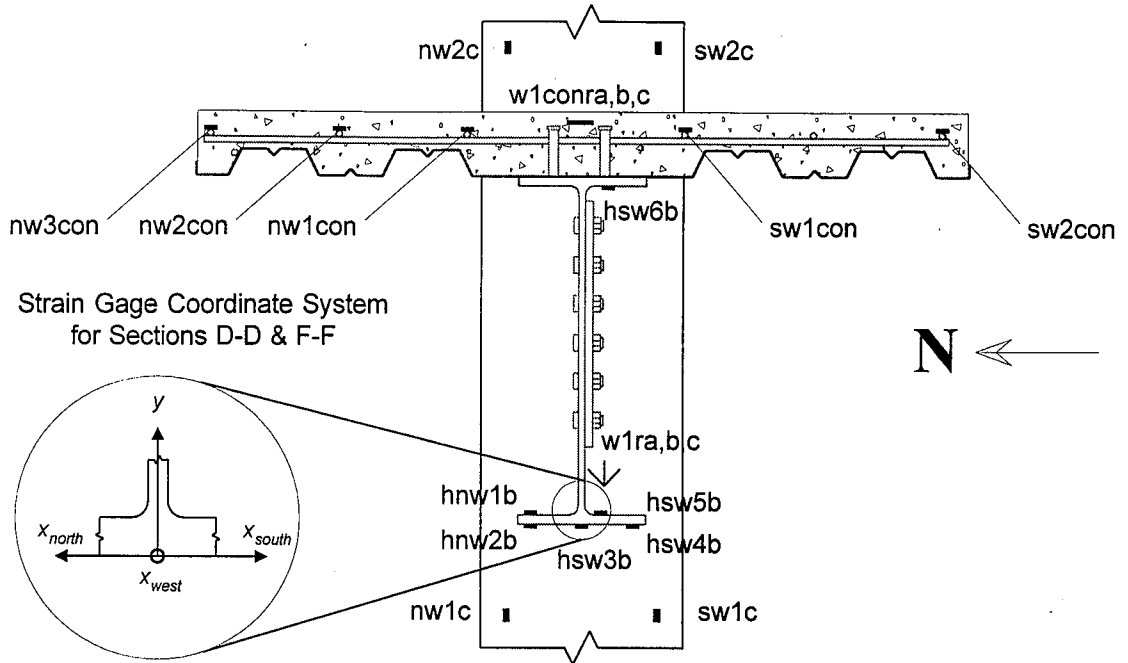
Section D-D: Strain Gages of West Girder Cross Section
